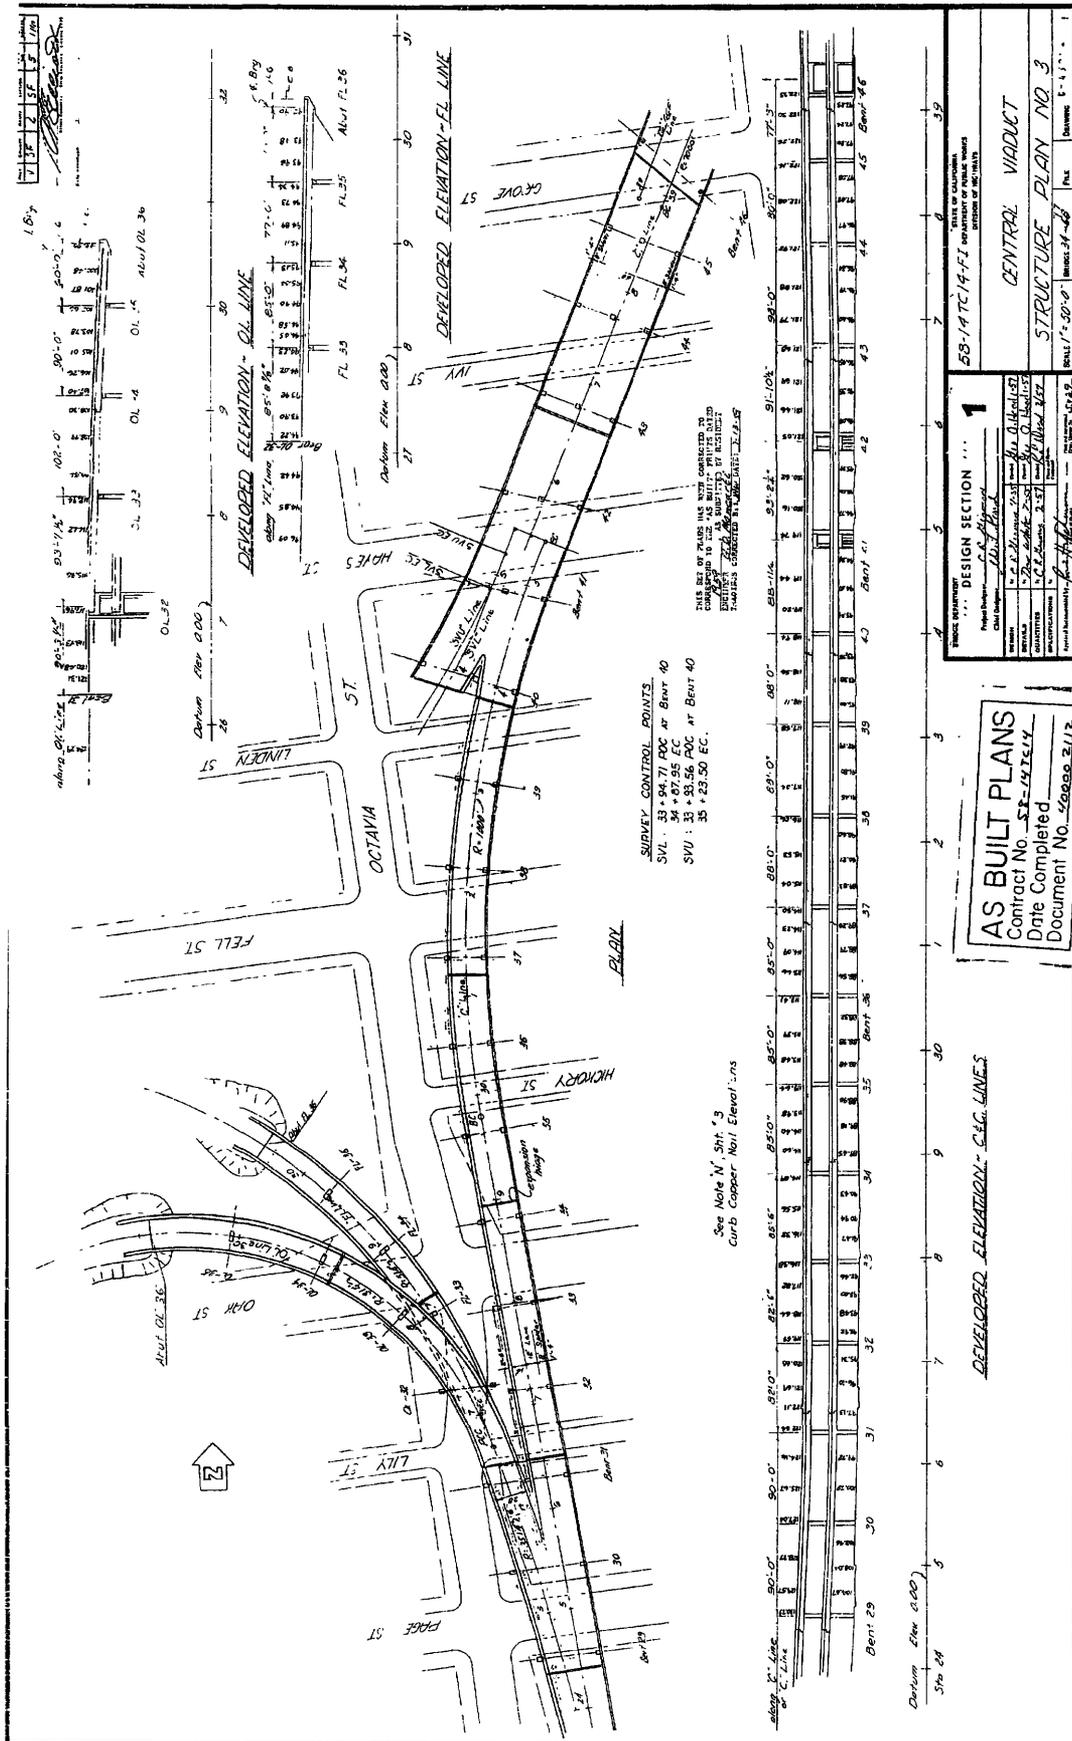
Structural Plan drawing of damaged area at Central Freeway Viaduct.
